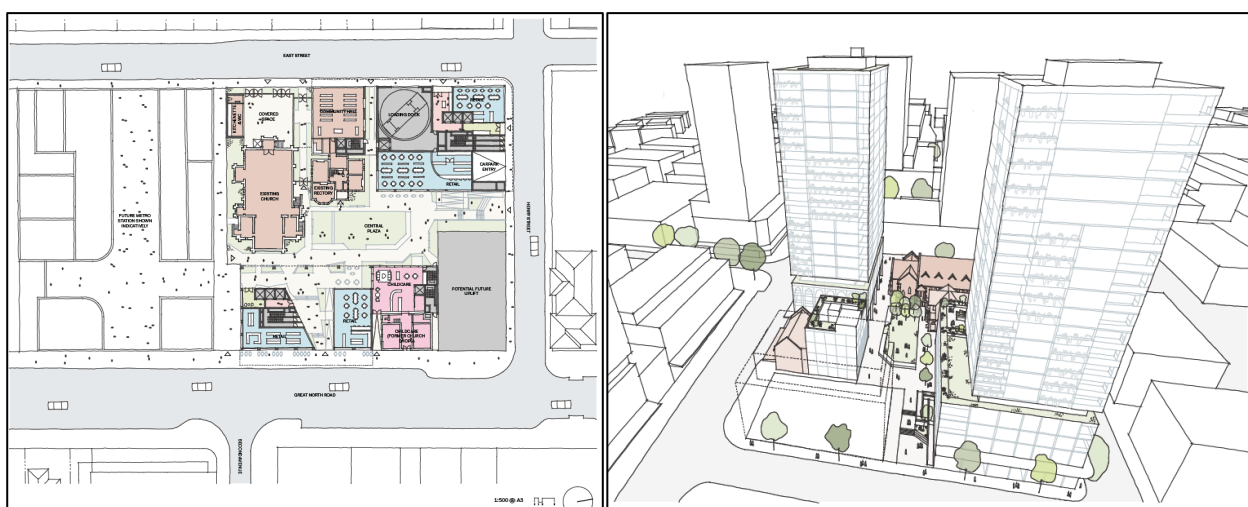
Ground Floor Plan (Left) and 3D View looking south towards Metro station
